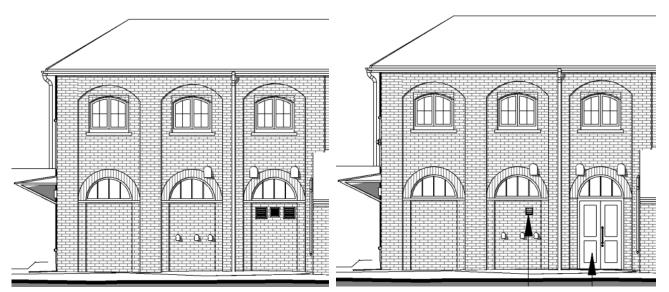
(left): Detail from existing Section FF – showing north-east elevation of 1920s rear extension to George House. Figure 72 (right): Detail from proposed Section FF. Note new door opening to the rear of George House (north-east elevation).
